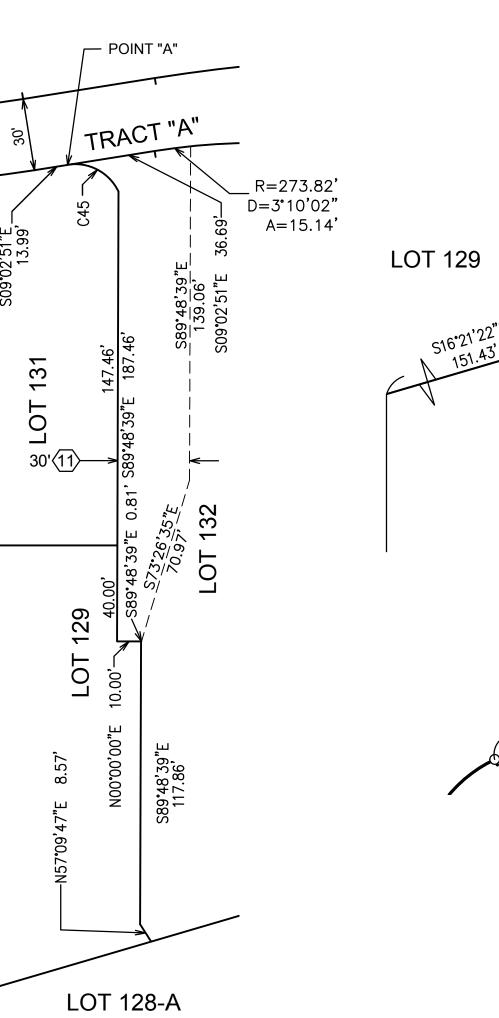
DETAIL "B" - GUARD HOUSE EASEMENT 1" = 20'
